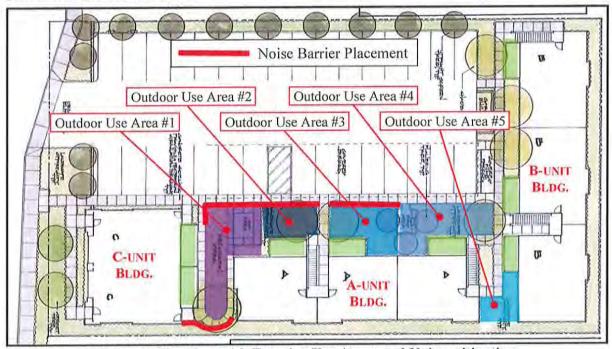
Site Plan with Exterior Use Areas and Noise mitigation
